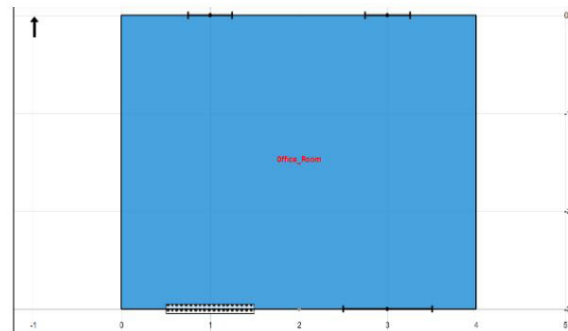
Building plan view. Typical hostel room size at IIT KGP
